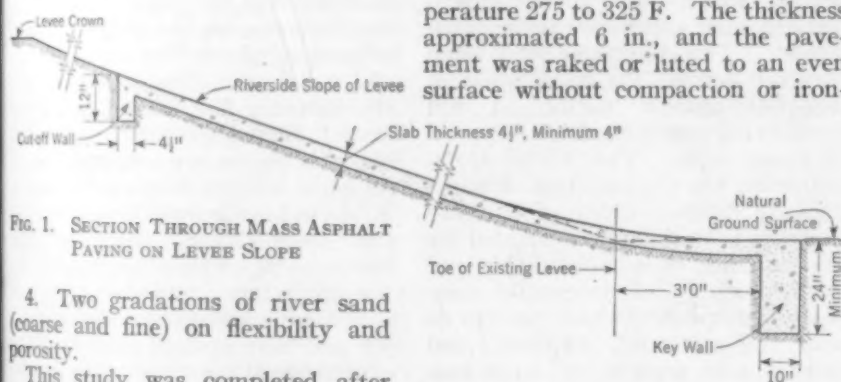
SECTION THROUGH MASS ASPHALT PAVING ON LEVEE SLOPE
